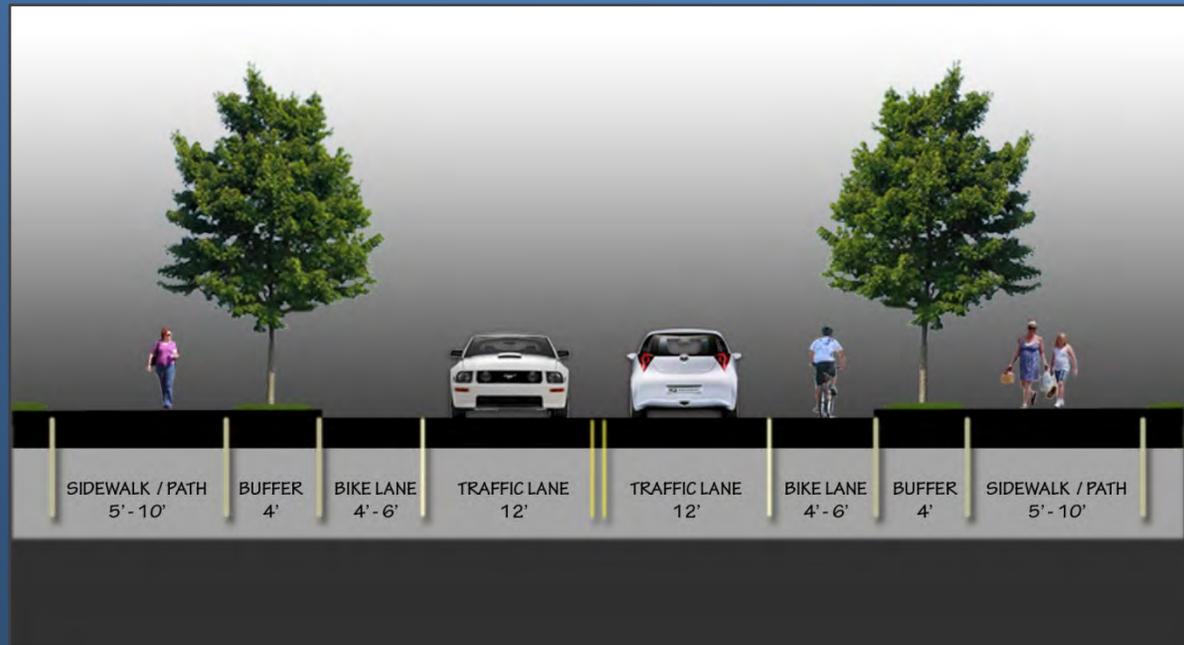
Typical roadway cross section for a "complete street" with sidewalks, bike lanes and landscaping.
